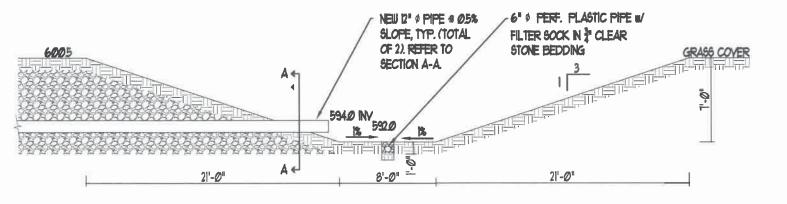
IRRIGATION POND DETAIL SCALE: 1/8" = 1'-0"
